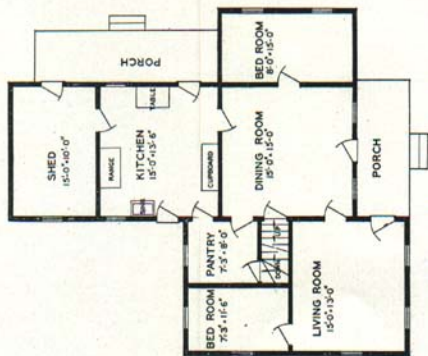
Original house plan. Note the poorly arranged kitchen.
